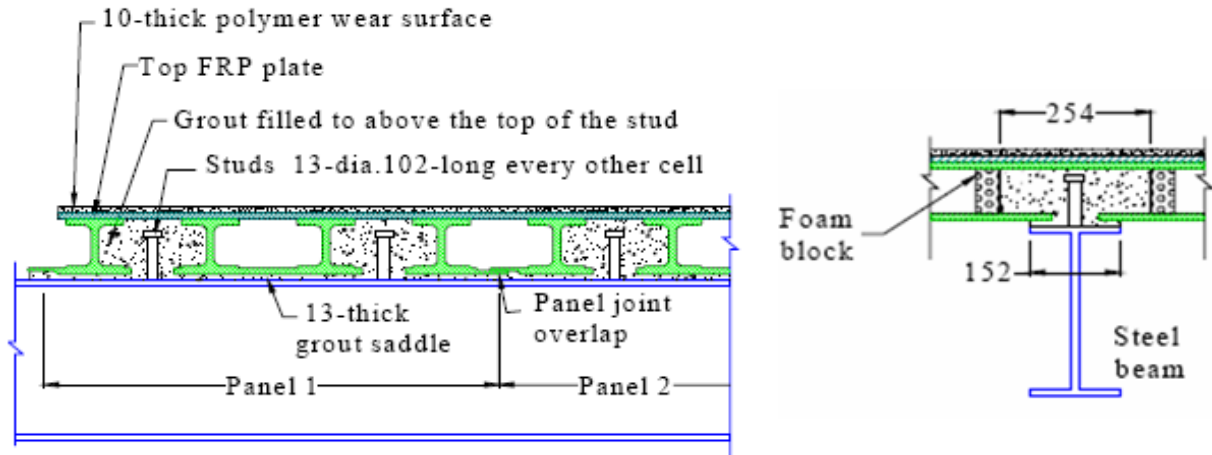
FRP deck with grouted stud connection (Zhao et al. 2006) (left) elevation; (right) cross section
